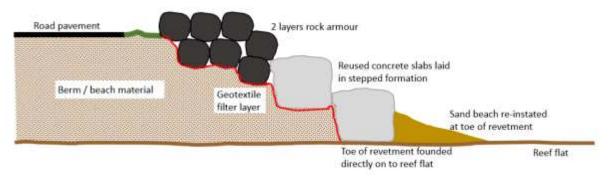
Cross-section of the proposed reconstructed revetment at Mosral
